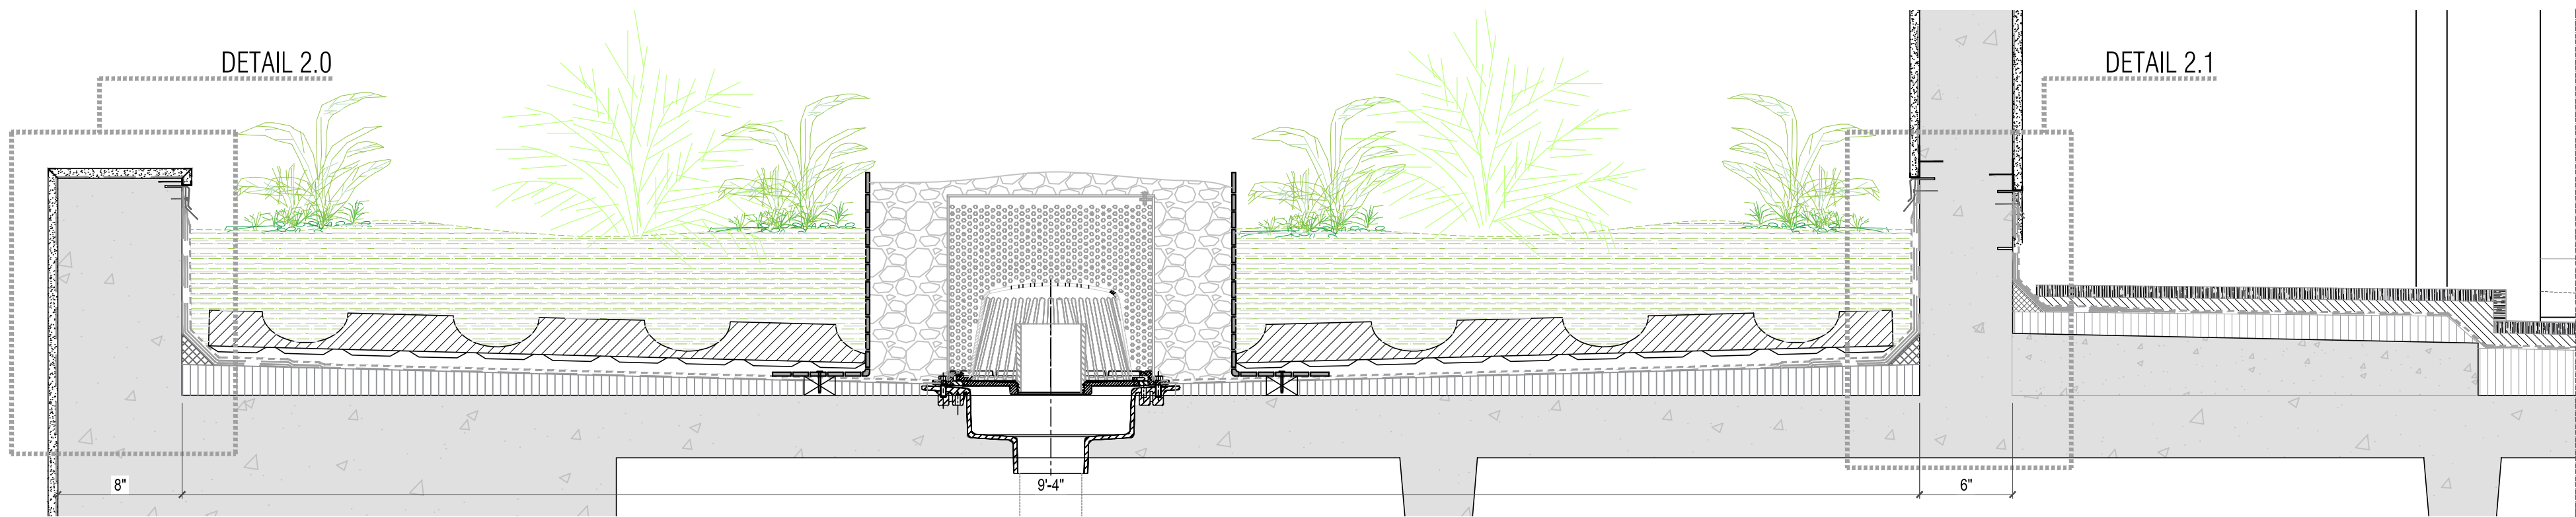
PARAPET WALL BETWEEN TURF ROOF AND PLANTER
